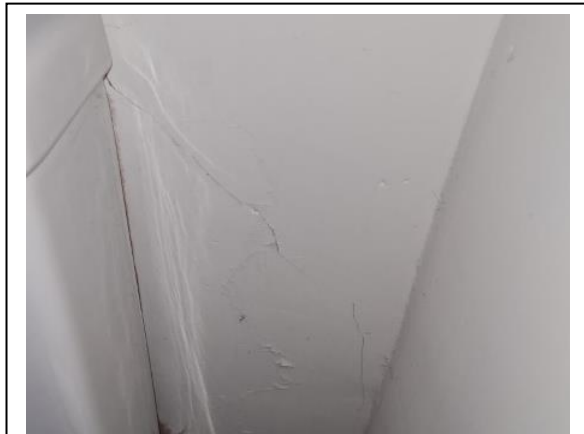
Flat 20 – Bathroom - Cracking Below RHS of Window
